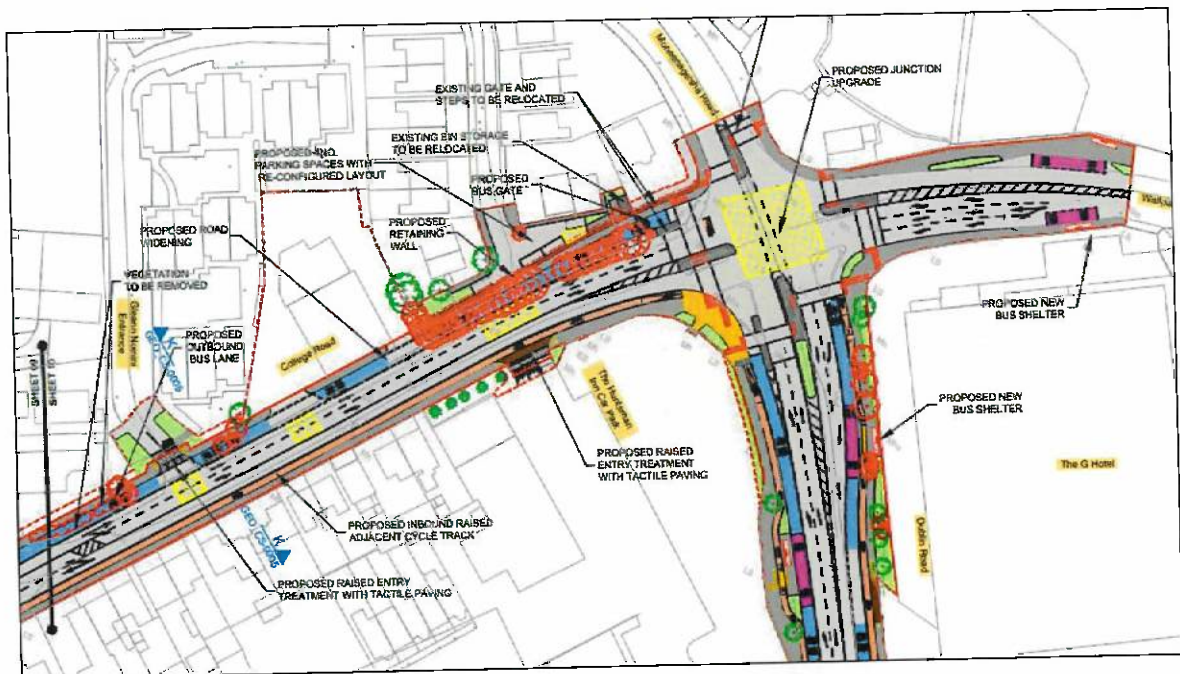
Scheme Plan for College Road. (Source: ARUP, 2022).
